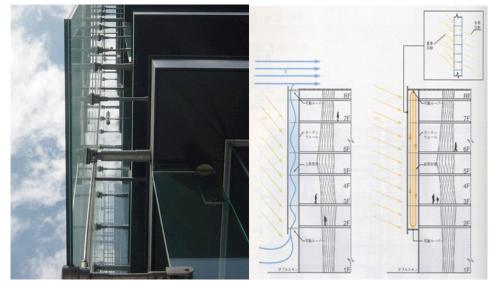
Section Diagram of Natural Ventilation System Down Out Open Windows (URL 36).
